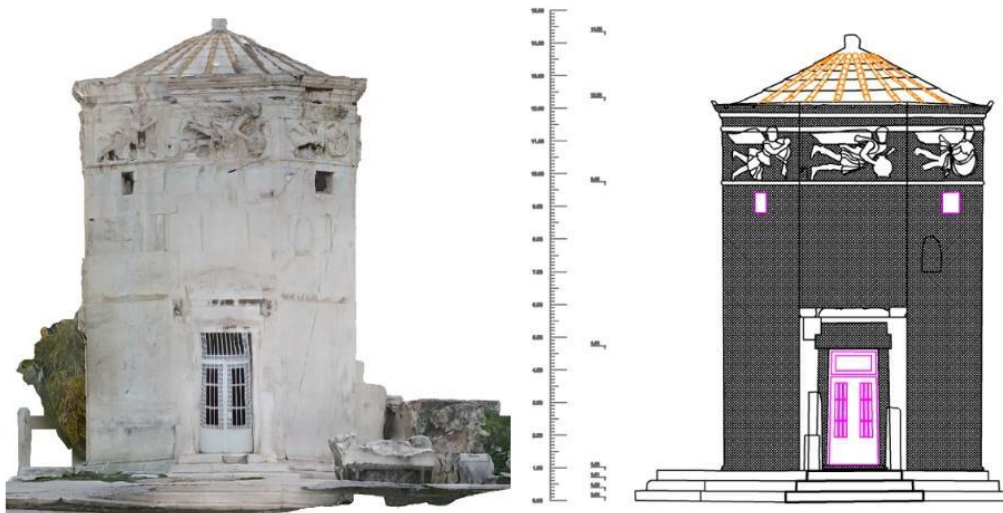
North-West Façade orthophoto and plan (edited by author in software: Agisoft Photoscan).
